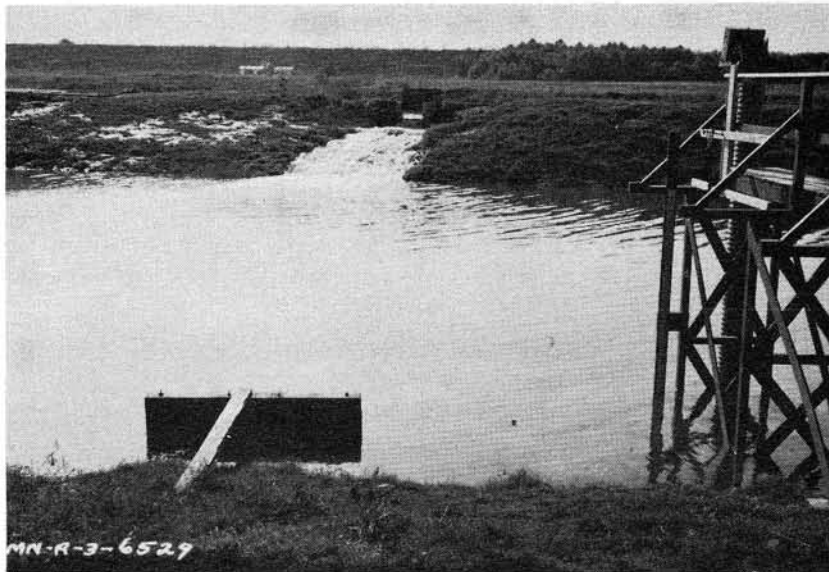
Test Site at Stillwater, Oklahoma. Dam on Lake Carl Blackwell, Siphons, and Valve House in Background; Parshall Flume and Gate in Upper Center Discharging 20 cfs; Headwall for Experiment 5 in Foreground; Staff Gage and Stilling Well at Right.
